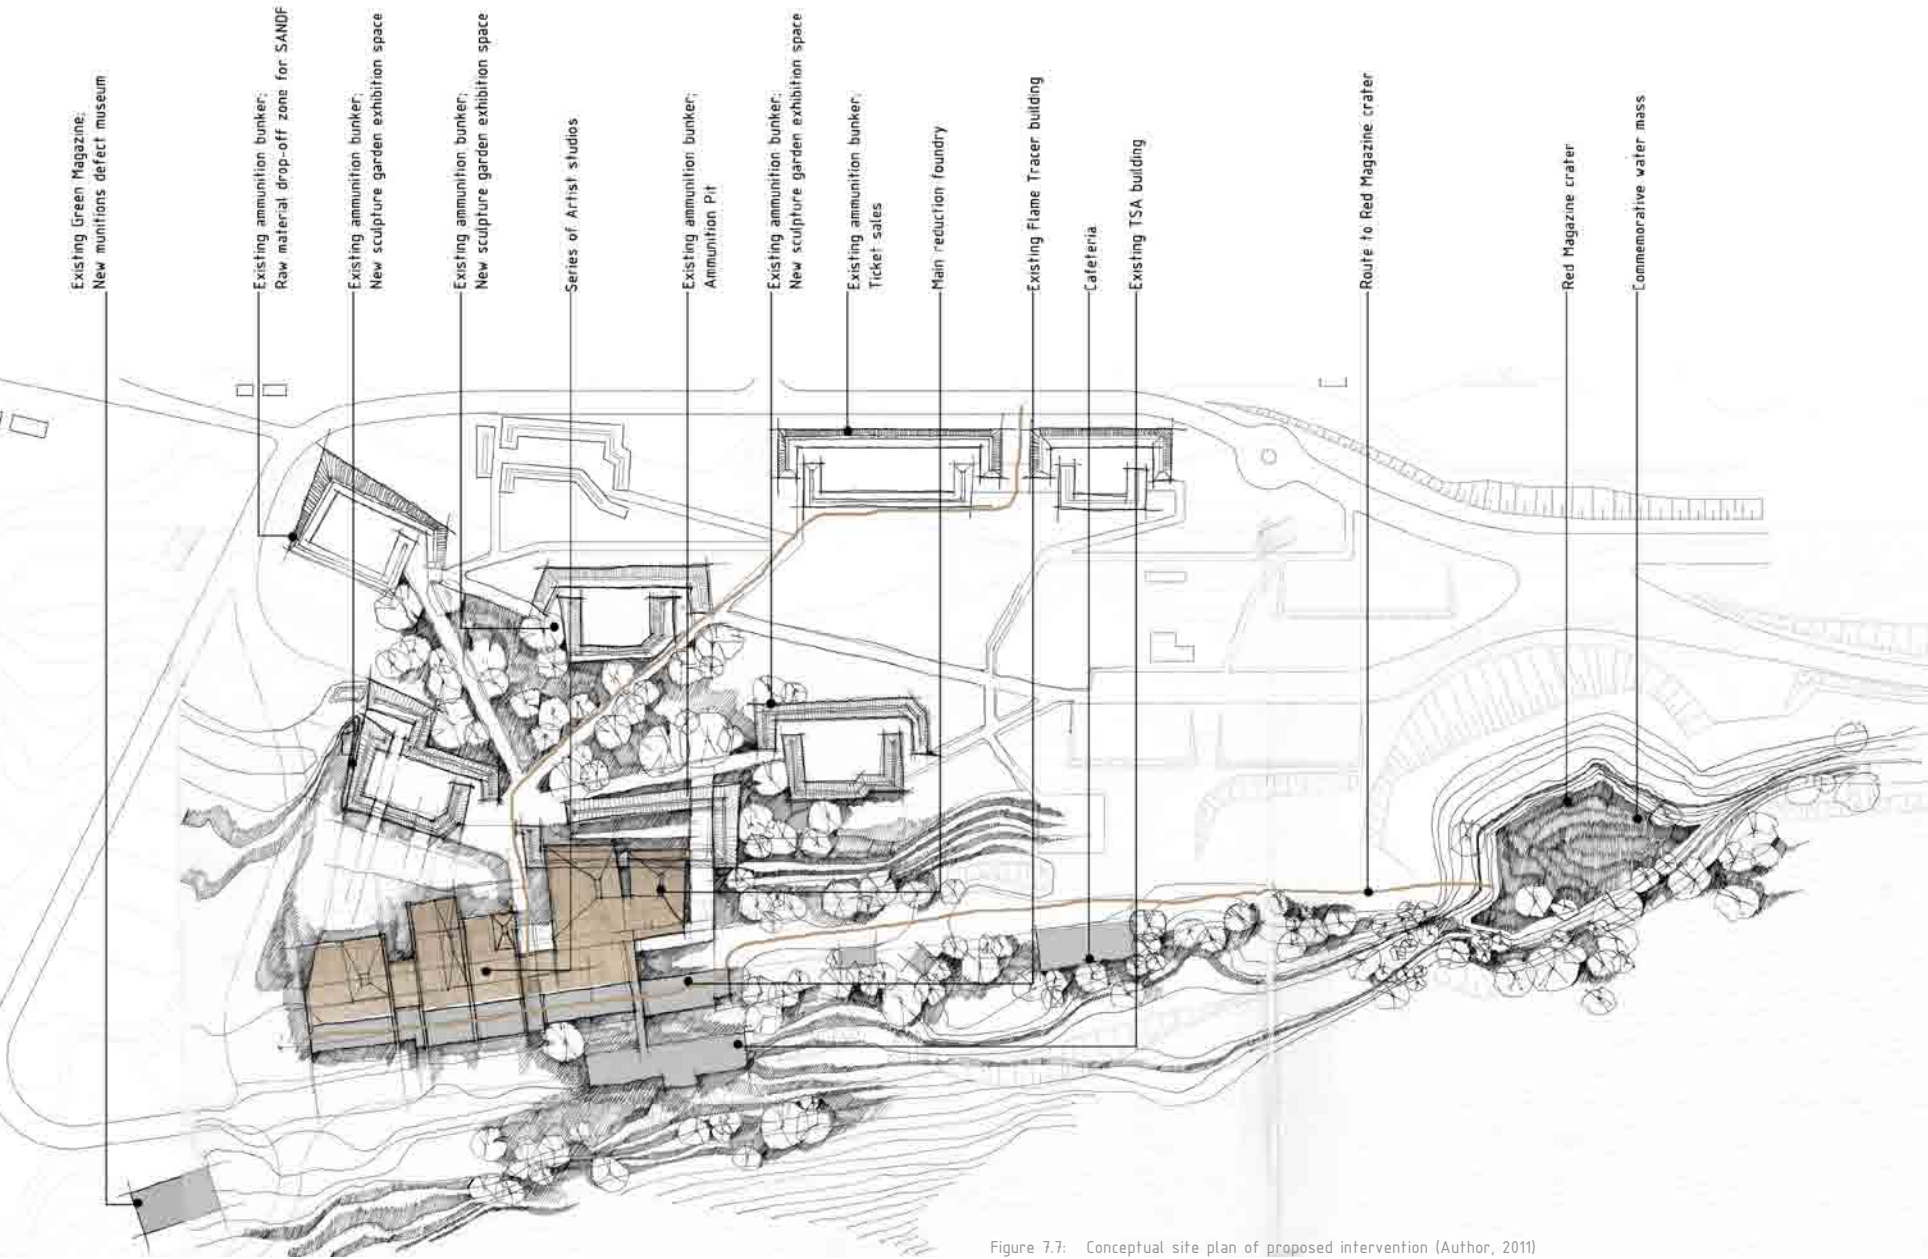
Conceptual site plan of proposed intervention (Author, 2011)
